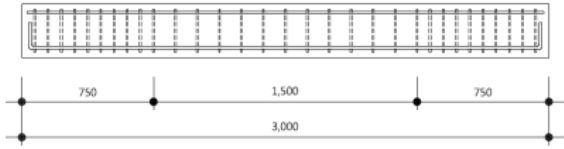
Schematic diagram of longitudinal section of RC beam.
